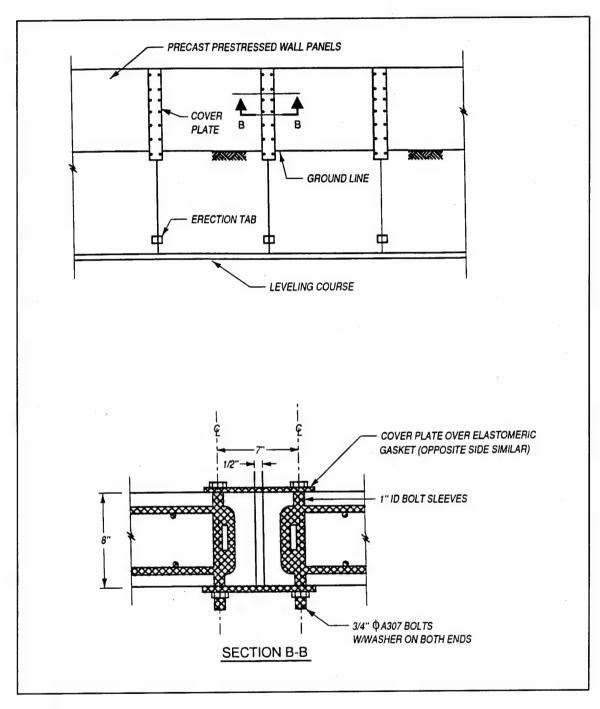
Typical wall elevation and joint detail, McClure Dam (after Kraai 1989)
